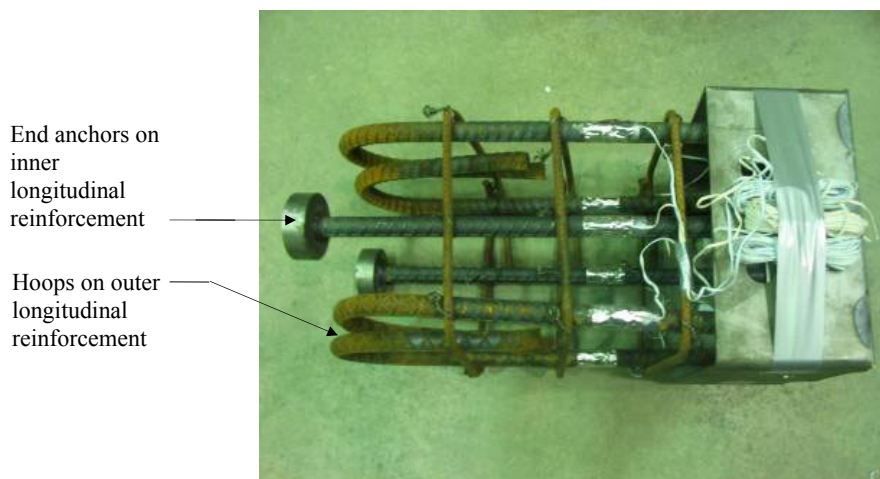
Photograph of Column 6, 2 ft. segment reinforcement and collar.
